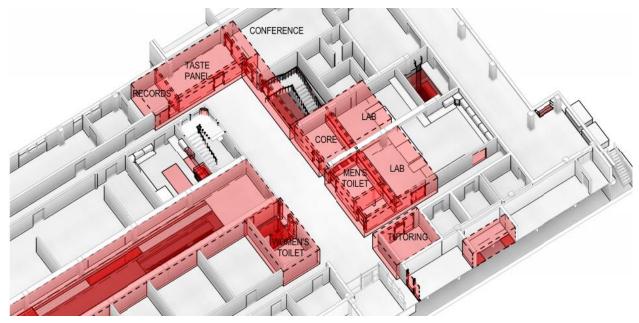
Phasing Diagram Demo Floor Plan, Level 2
